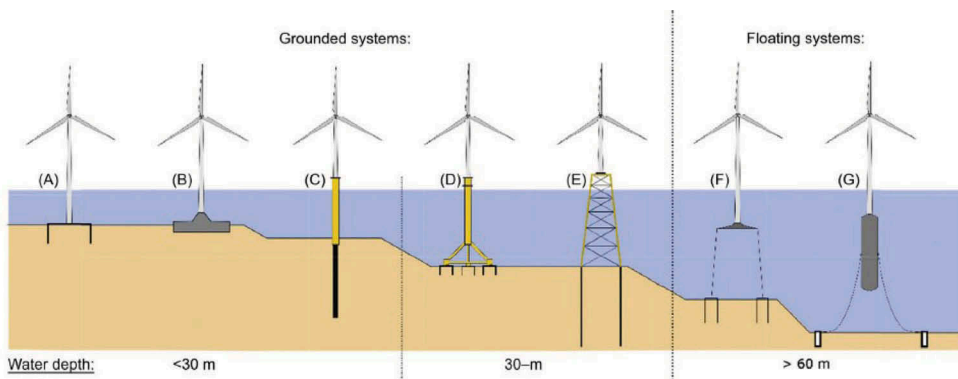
Different types of the foundations of offshore wind turbine, from left to right: A) bucket foundation; B) gravity foundation; C) monopile foundation; D) tripod caisson, E) jacket foundation, F and G) floating structures (Barari and Ibsen, 2014)
